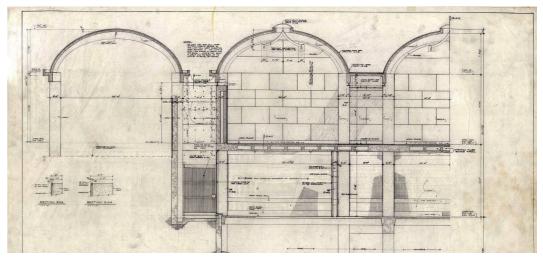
Building section, Kimbell Art museum, Louis Kahn (1972) • Source: Louis I. Kahn Collection/ University of Pennsylvania
